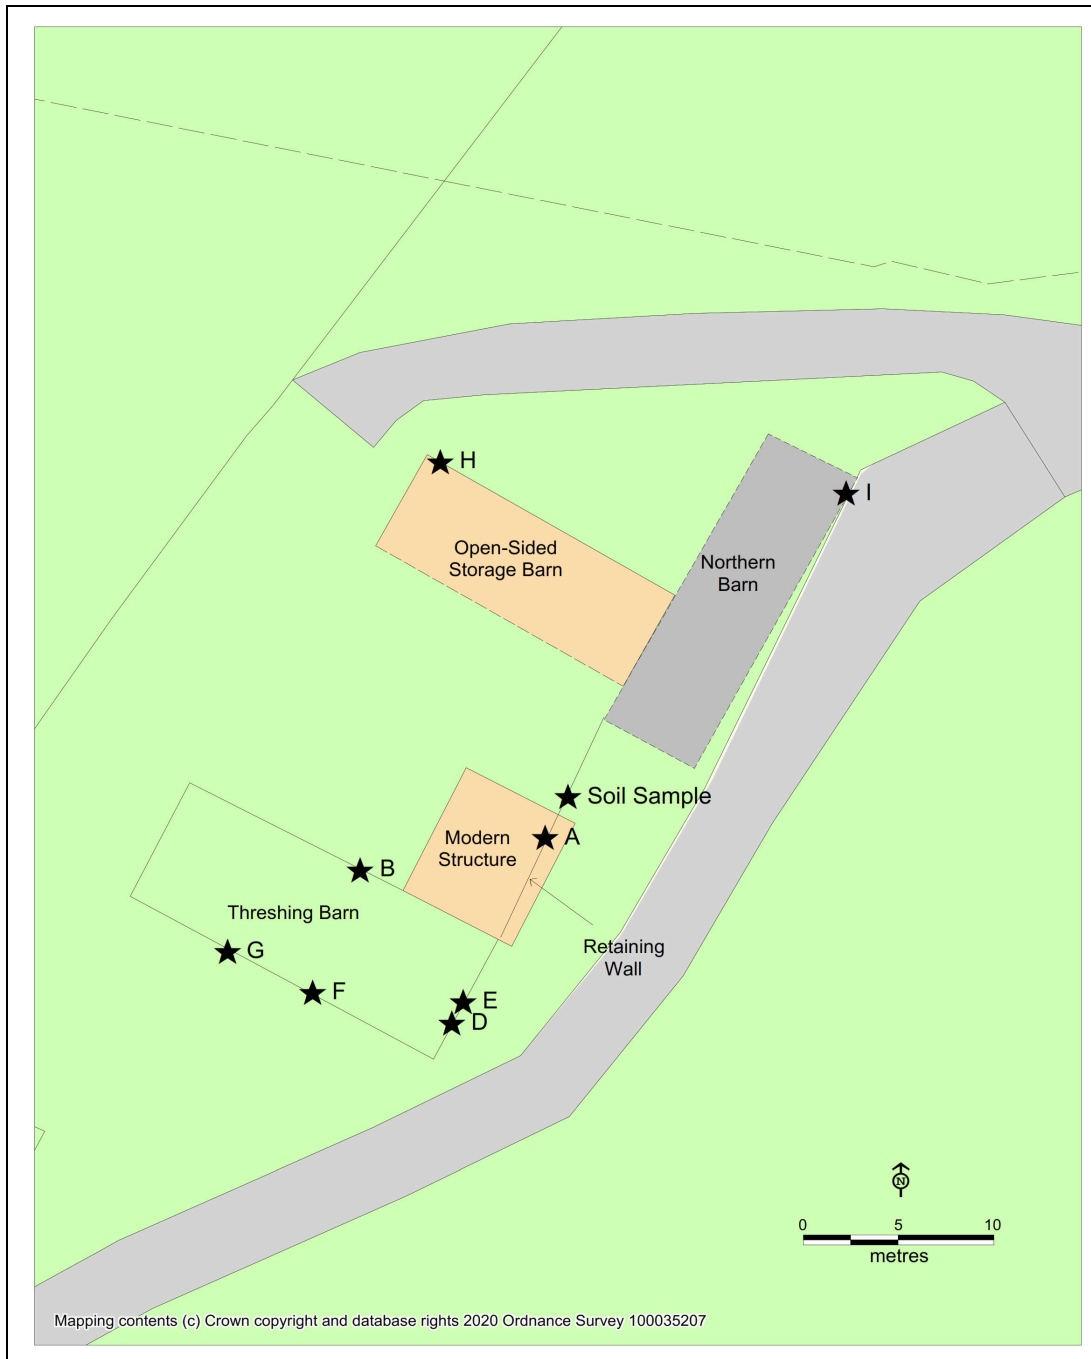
Plan of Gethley Barn complex showing the locations of mortar and soil sample points, details in Appendix B.
